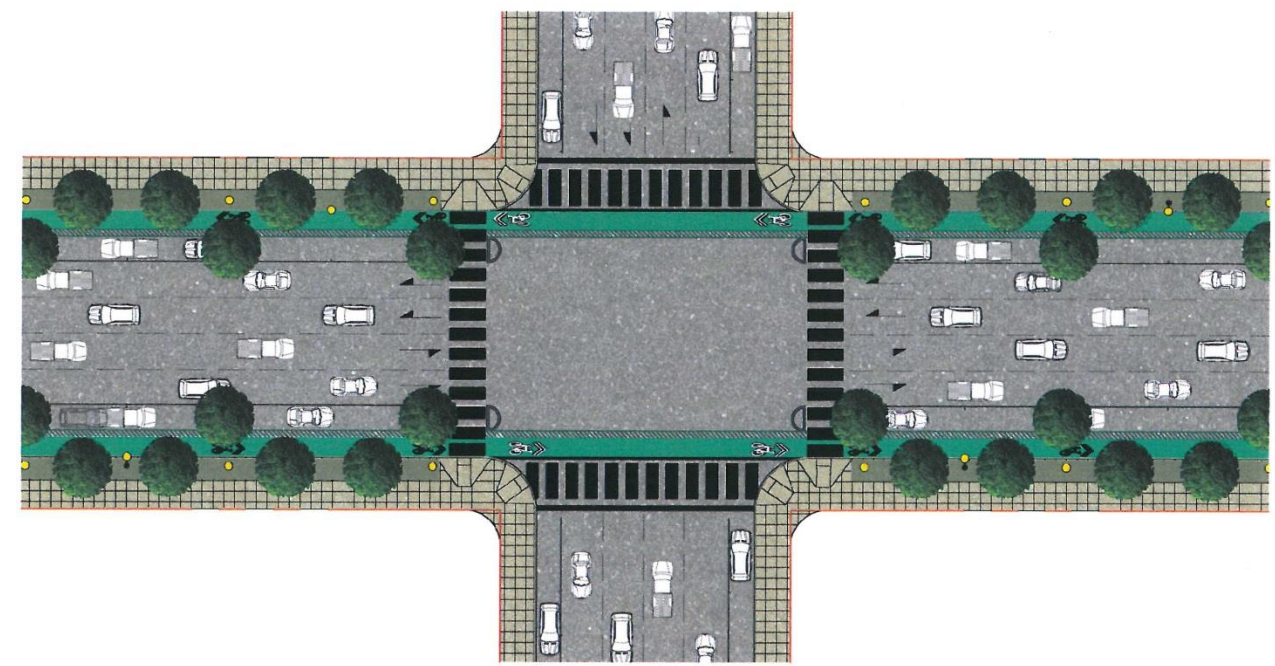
TYPICAL GRAND BOULEVARD PLAN LAYOUT
